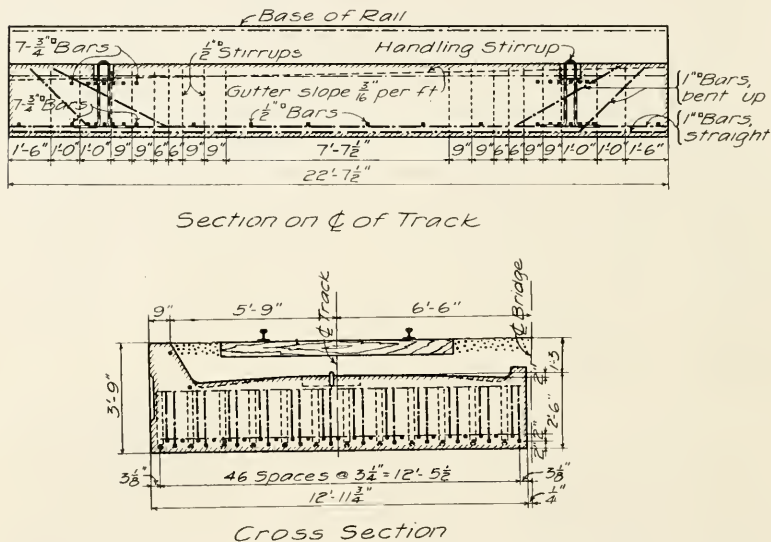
DETAILS OF ROADWAY SLAB—CHICAGO AVENUE SUBWAY BRIDGE.
